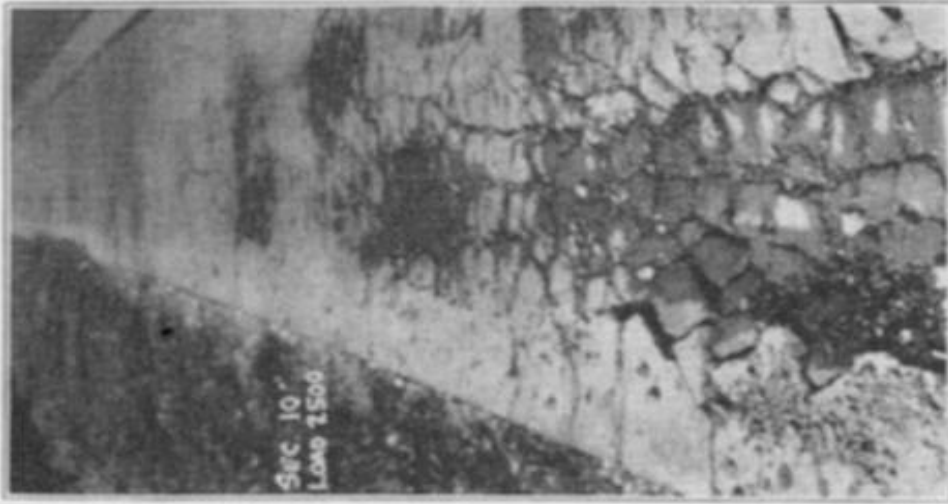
TYPICAL FAILURE OF ASPHALTIC CONCRETE SURFACING ON MACADAM BASE.
